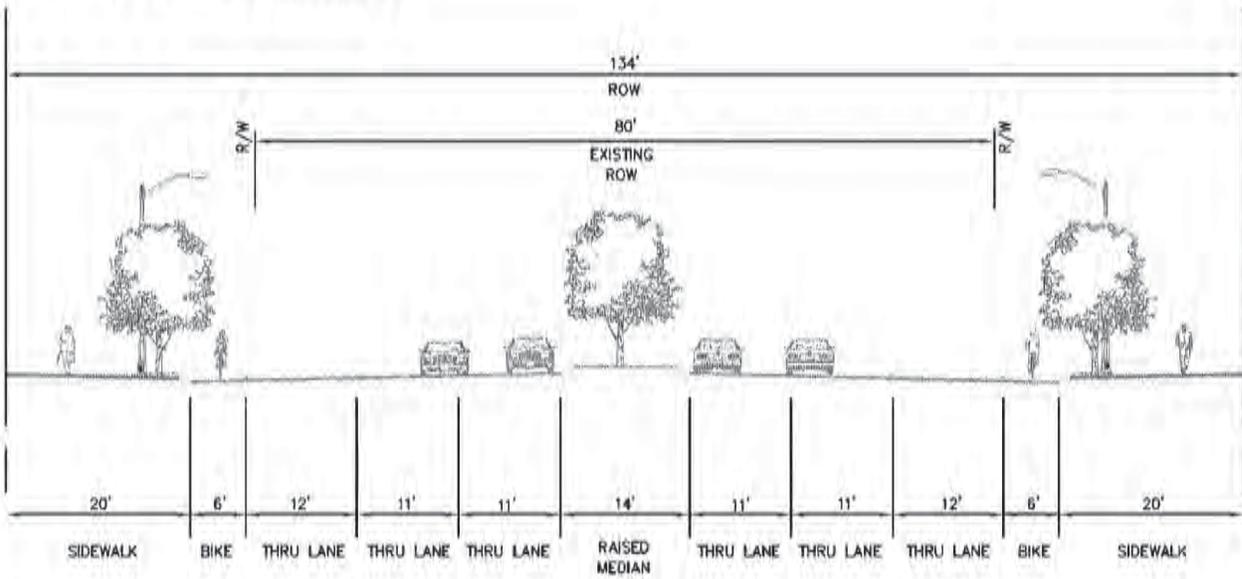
Proposed Cross Section, H Street Between Broadway and I-5
